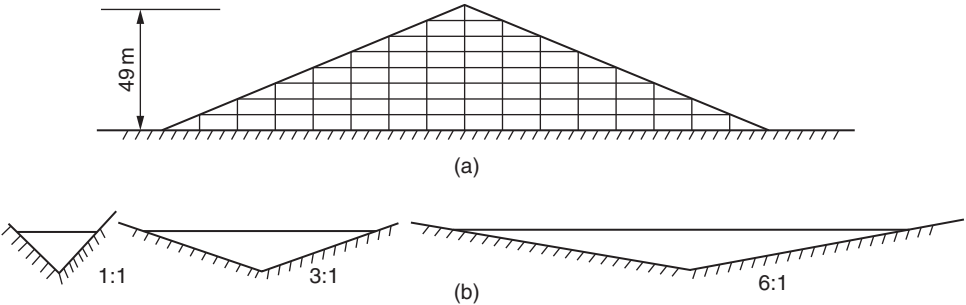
Earth dam section. (a) Cross section and (b) longitudinal section.
